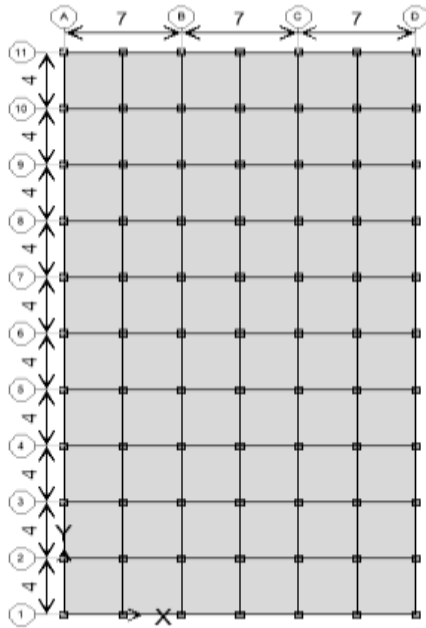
f: Plan of Type 5.5 model (with floating columns)
